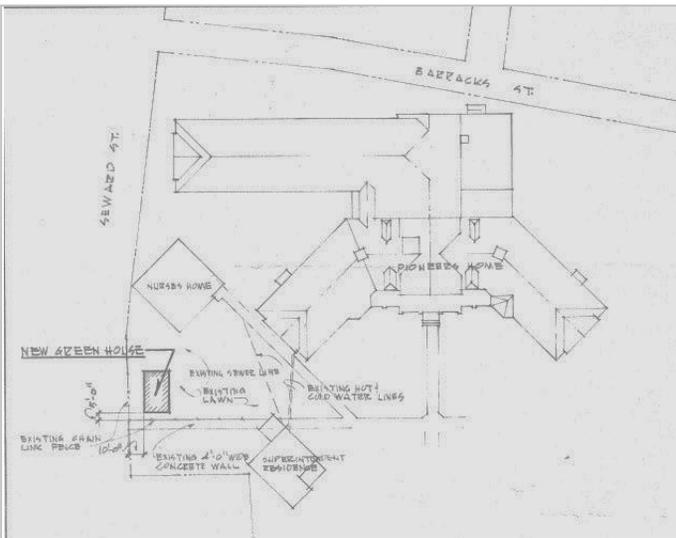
Greenhouse site plan cropped. Source: DOT & PF project no. H60044, Everett A. Simpson, AIA Architect, plans on file at DOT Southeast.
